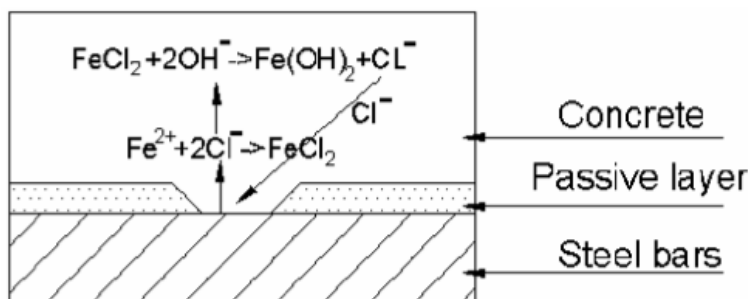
Point defect model of pitting corrosion (Macdonald, 1992)
